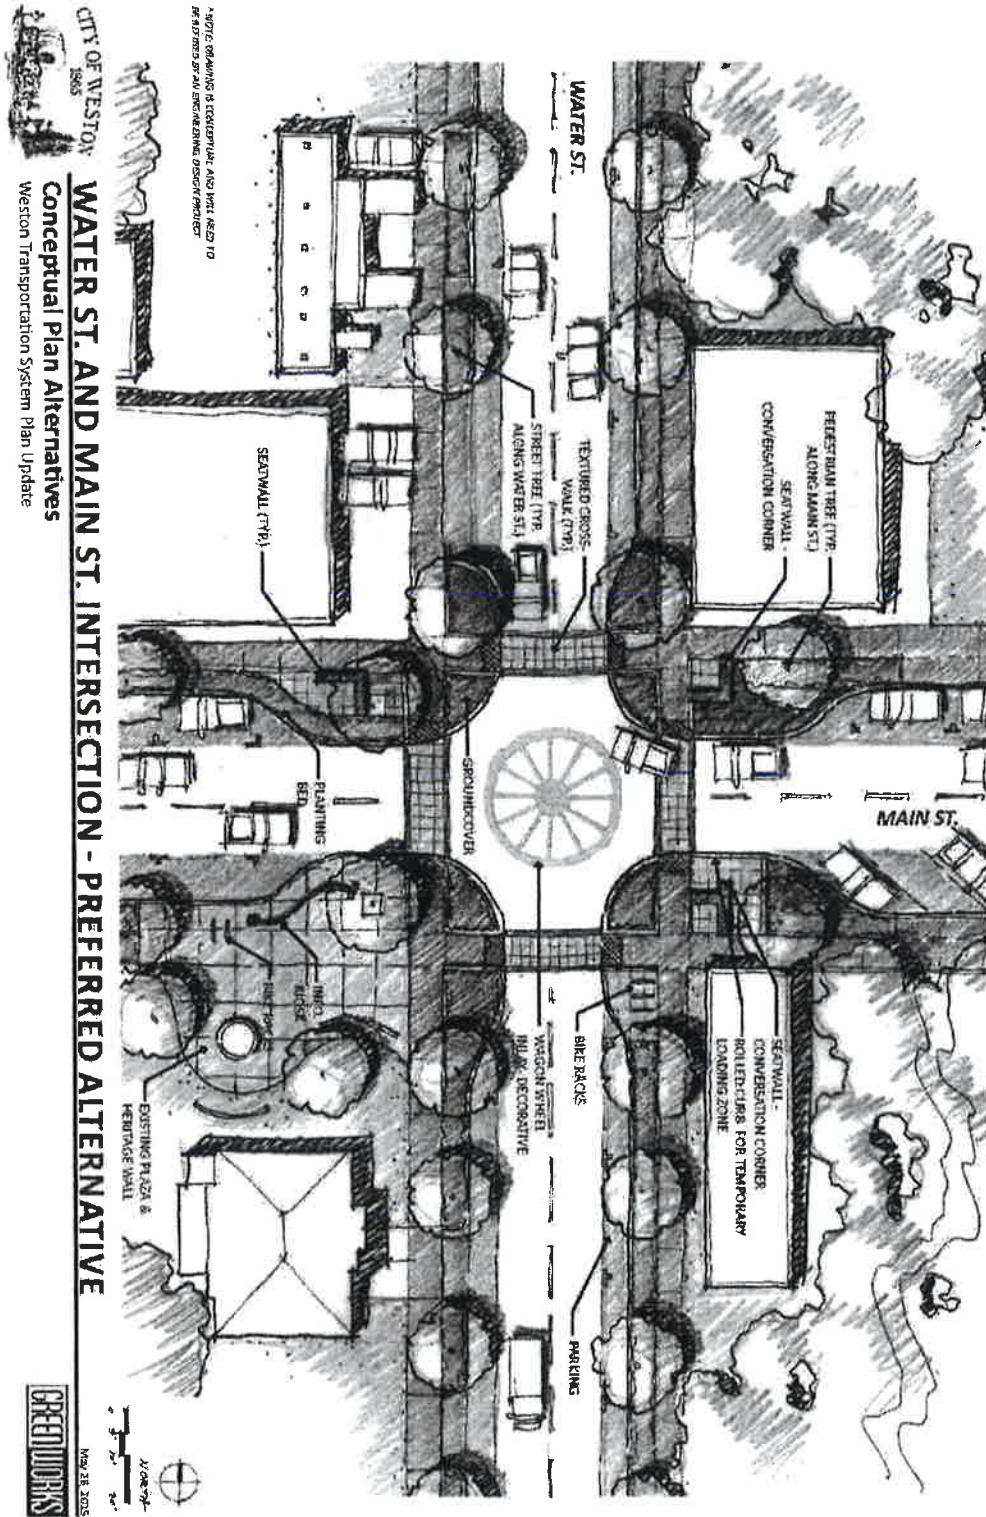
Project #2 - Water Street/Main Street Intersection Plaza Enhancement
